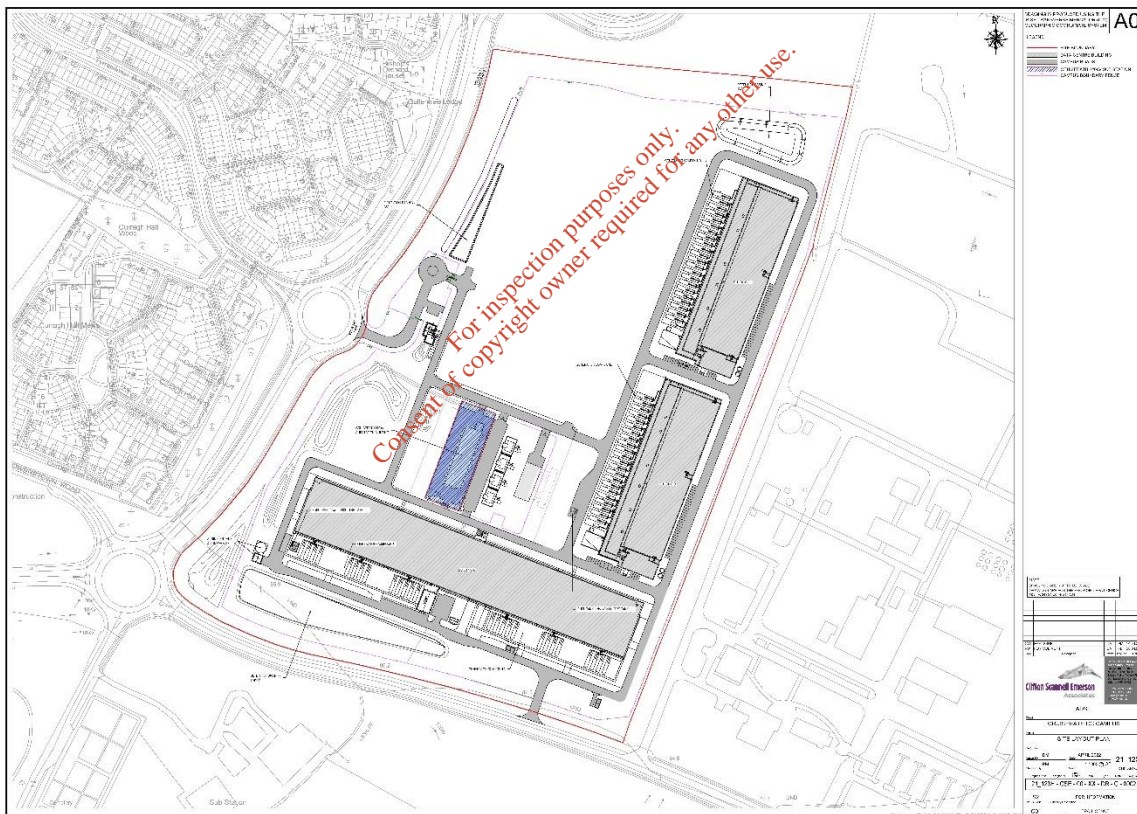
Site Location (21_123H-CSE-00-XX-DR-C-0002 - Overall Site Plan)
